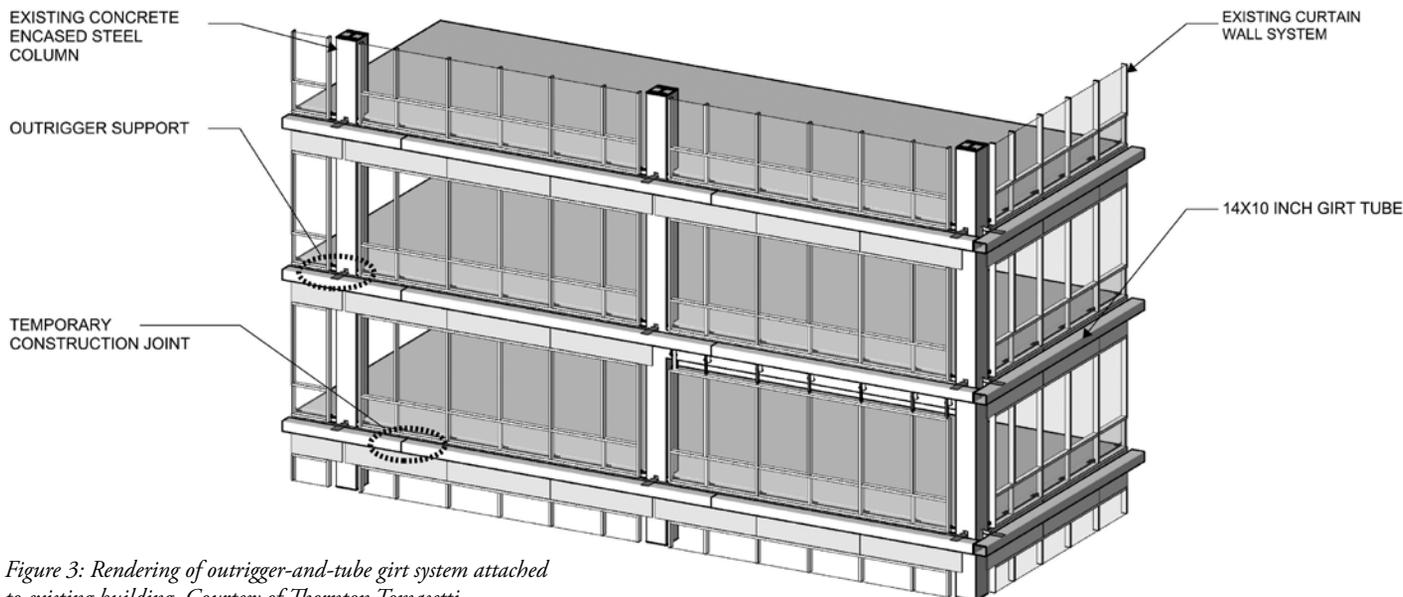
Rendering of outrigger-and-tube girt system attached to existing building. Courtesy of Thornton Tomasetti.
